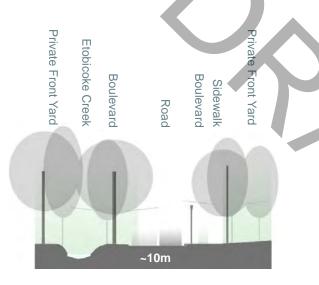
Current Main Street South roadway, looking south. (Source: ERA)
